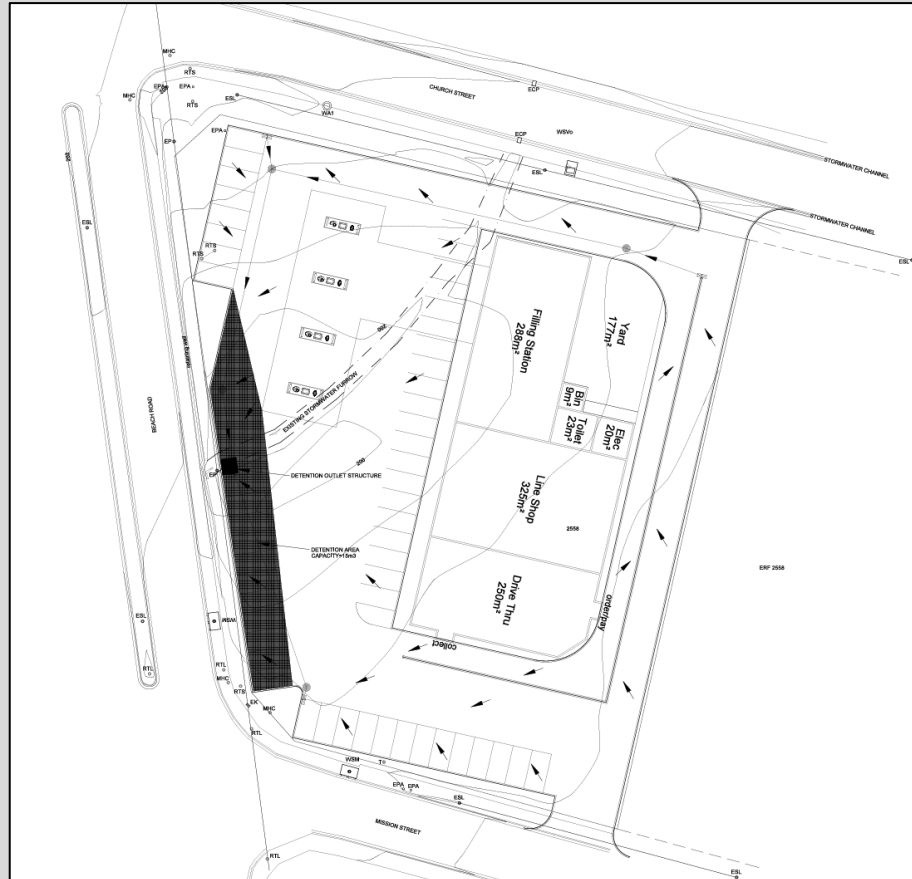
Stormwater management plan for the proposed development on Erf 7379 (DVP INC Consulting Engineers, 2023).
